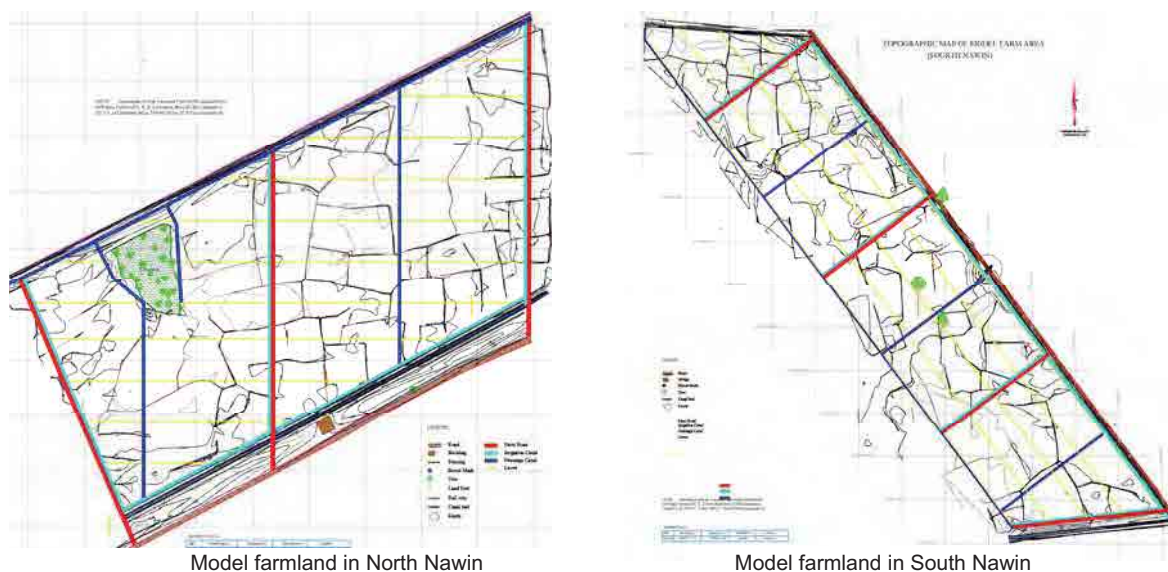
Outline Planning Drawings of Model Farmland Consolidation
